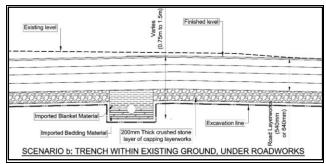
Scenario B: Services- Trench within existing round (Under road works) (source: Walters, 2020)
